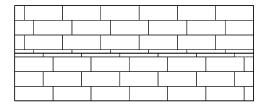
Roof Deck Sheathing Layout for House Model 1304G
